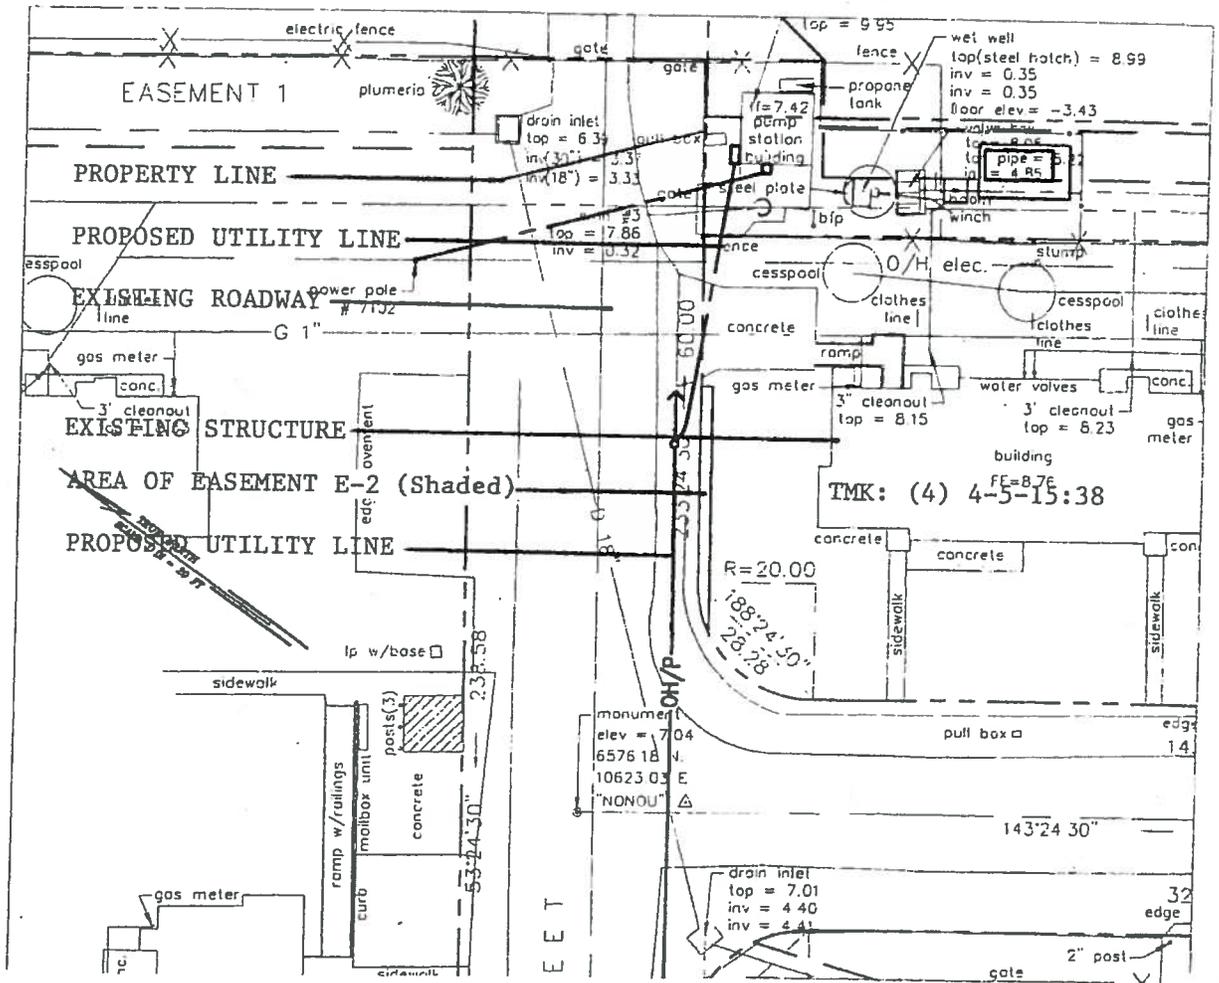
EXHIBIT F: ENLARGED PLAN - E-2 EASEMENT
